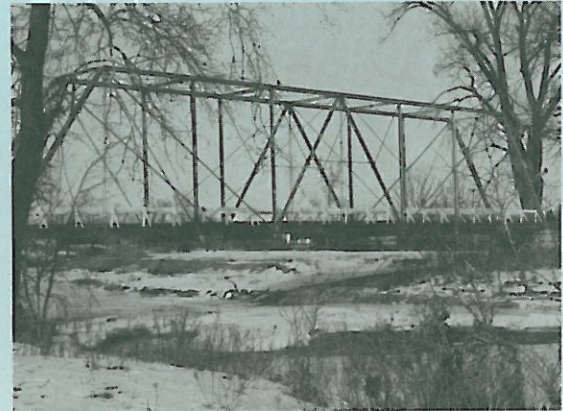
South Branch Raritan River Crossing over Hamden, N. J. Single-span pin-connected fink through truss, 1857.
